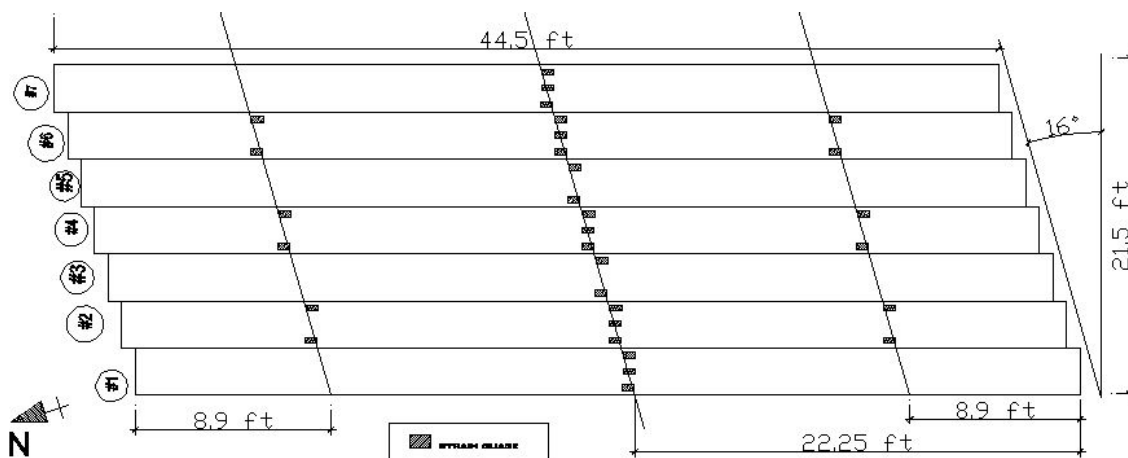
Plan view of instrumentation layout for diagnostic load testing (Bridge 7722).
